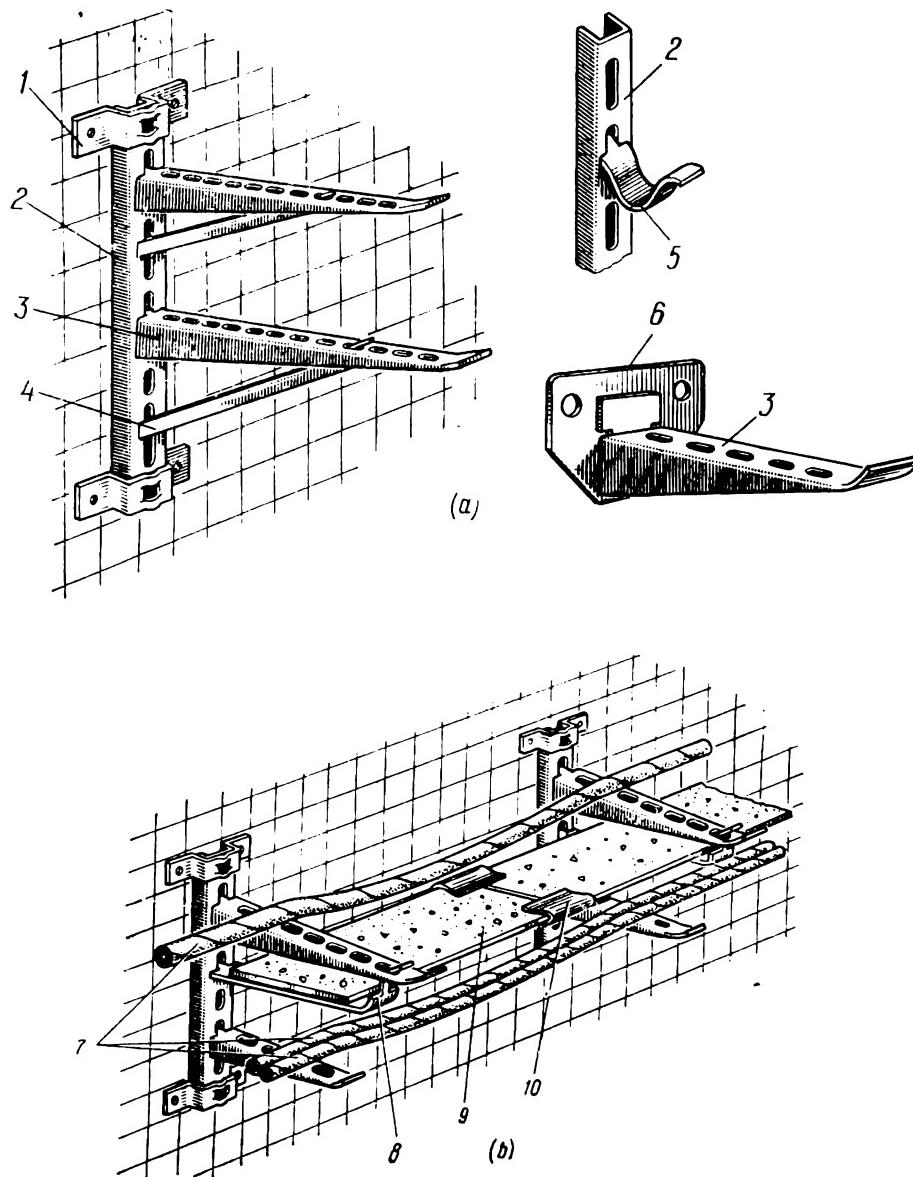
Supporting structures (a) and examples of cable laying on supporting structures (b)
